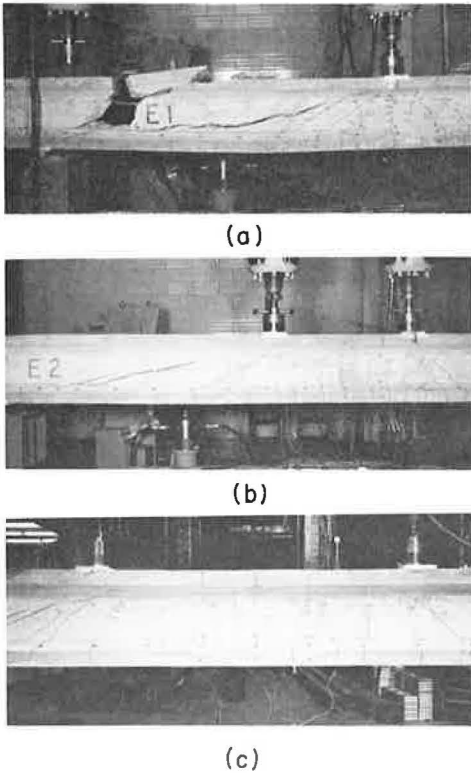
Beams after failure: (a) E.1, (b) E.2, and (c) E.3.
